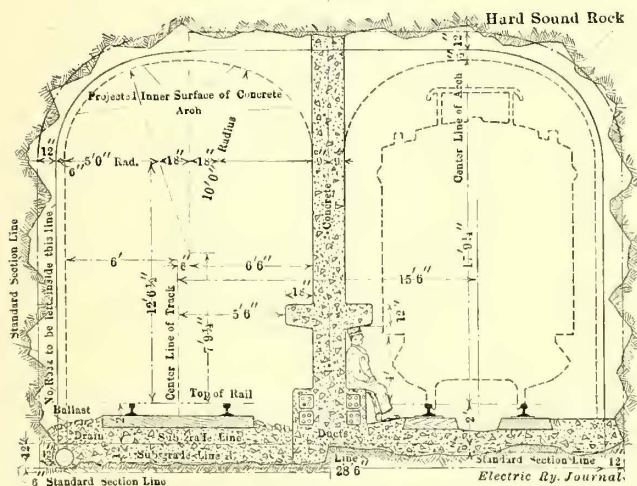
Montreal Tunnel—Typical Tunnel Section in Hard Rock
